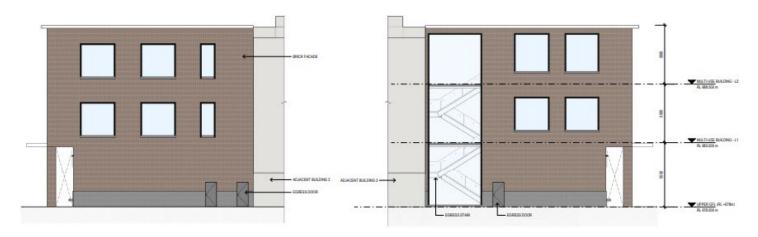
| Multi-Use Building Elevations (office, workshop, laboratory)
